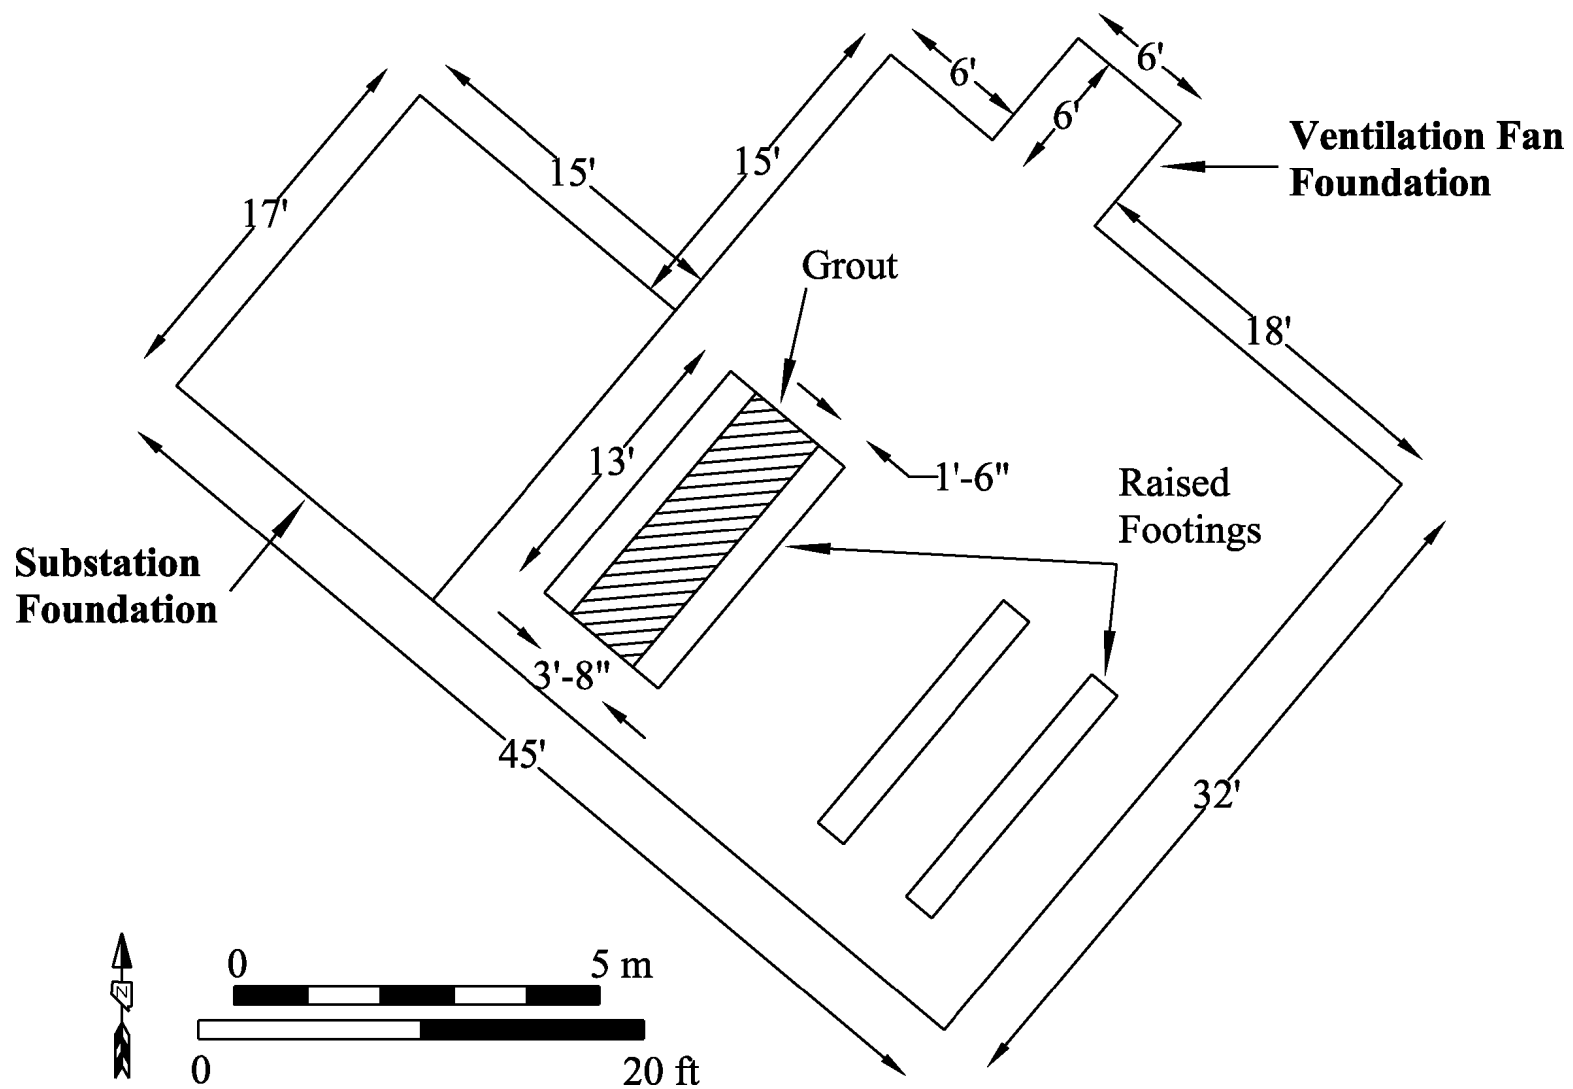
Plan map of Feature 55, ventilation fan and electrical substation concrete foundation.
